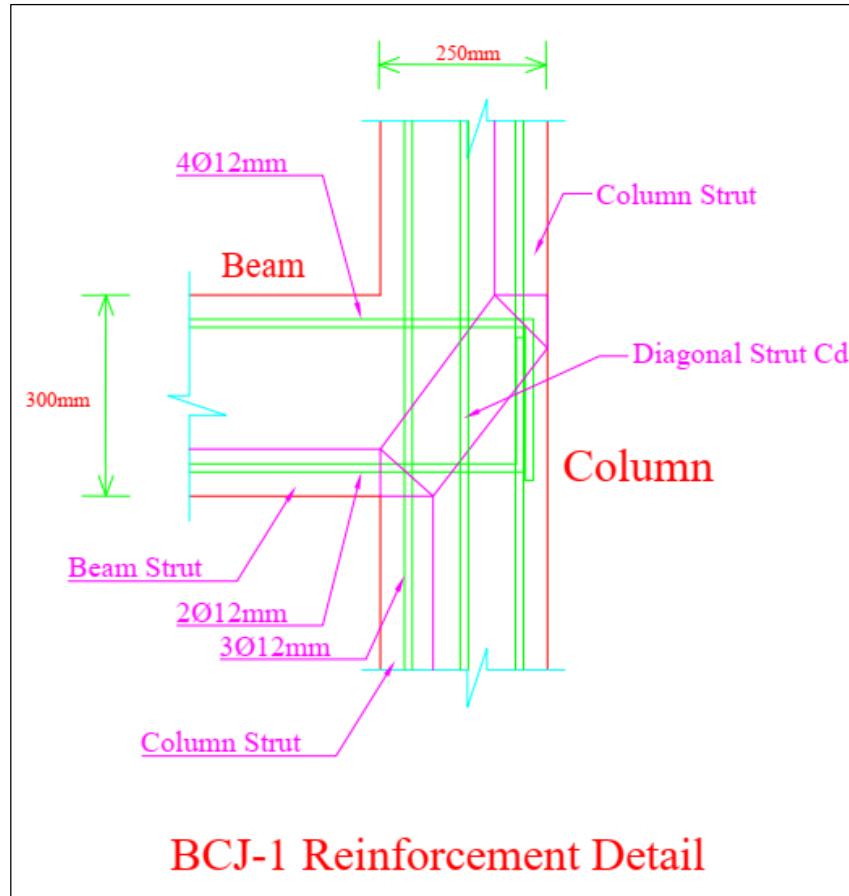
Reinforcement Detail of Beam-Column Joint-1
